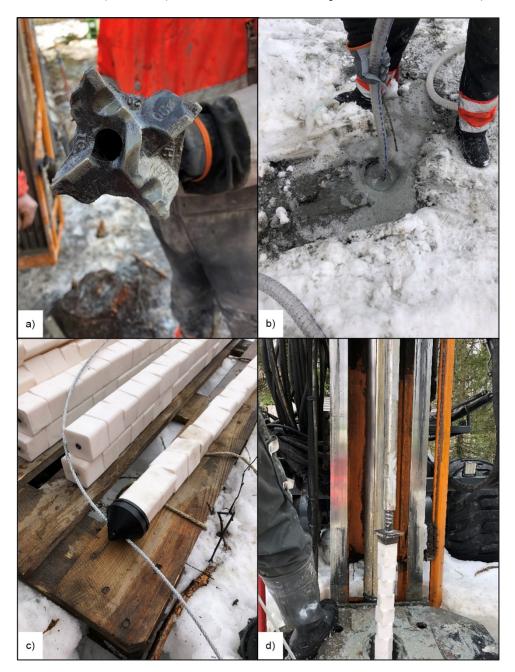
a) 90 mm drill bit used for pre-drilling. b) 32 mm reinforced hose for pumping KCl slurry into the pre-drilled borehole. c) KCl poles in 1 m sections ready for installation. d) Installation of KCl poles.
